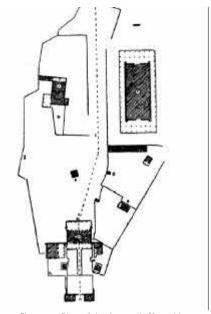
Plan of the Acropolis (from *Vers une architecture*)
